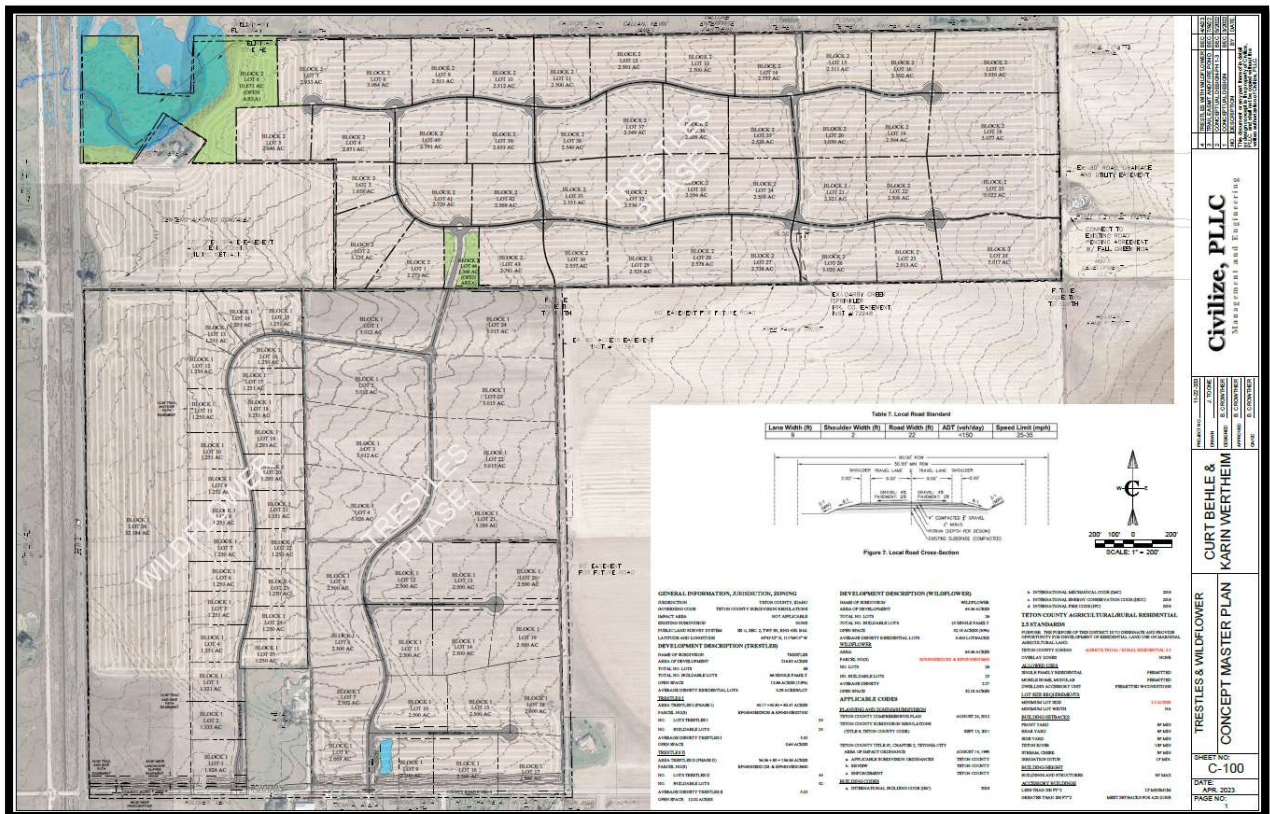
Master Plan for Trestles I, Trestles II, and Wildflower
